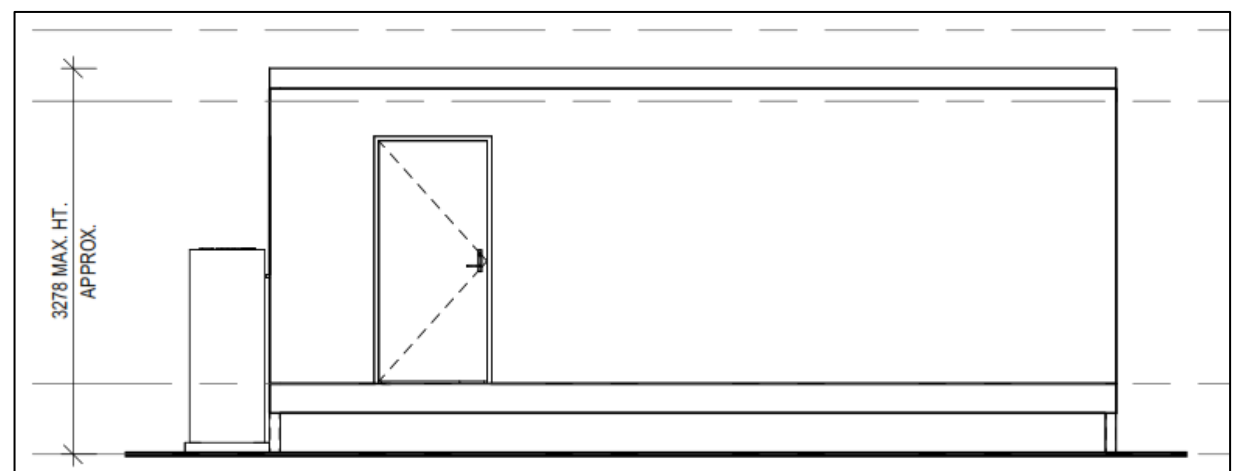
Laundry Module Elevation (Source: The Design House NQ, 2026)
